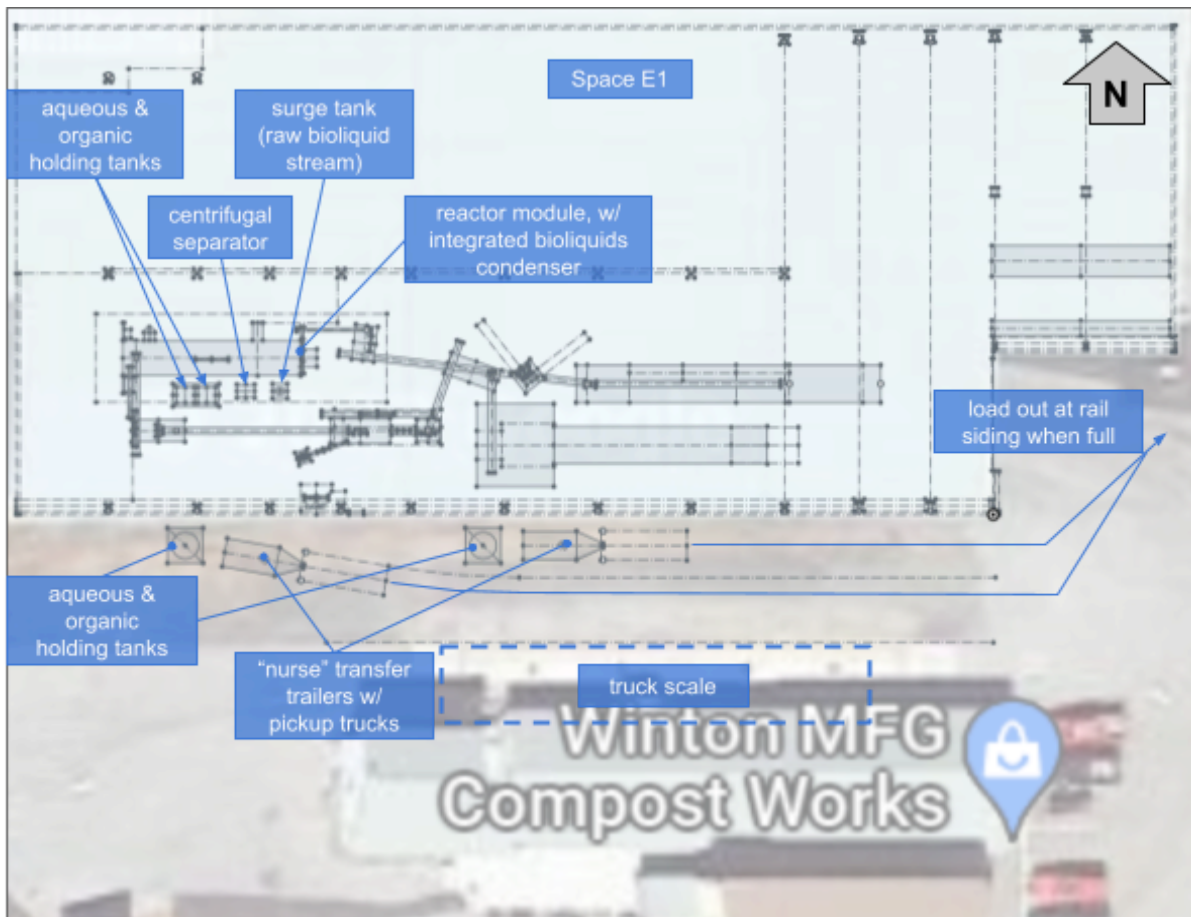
Potential pilot layout arrangement for bioliquids capture, separation and handling in and adjacent to Space E1.
